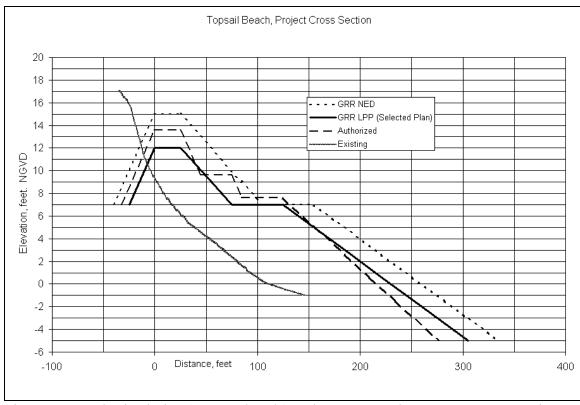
Authorized Plan (HD 393/102/2) and GRR LPP Plan 1250X, Cross section view
